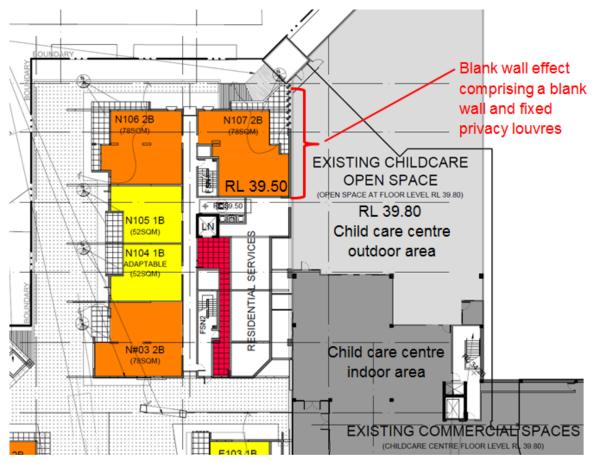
Extract from the applicant's Level 1 Plan demonstrating the blank wall effect between the proposed apartment and the existing child care centre (both the indoor and outdoor areas).
